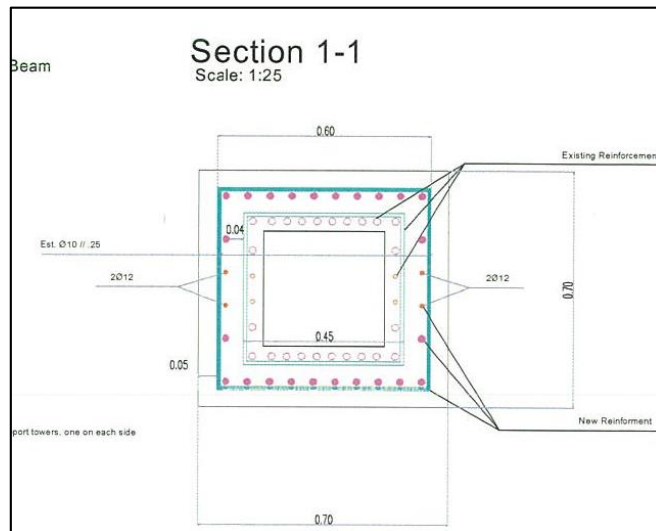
Cross section of strengthened columns with arrangement of new reinforcing bars
